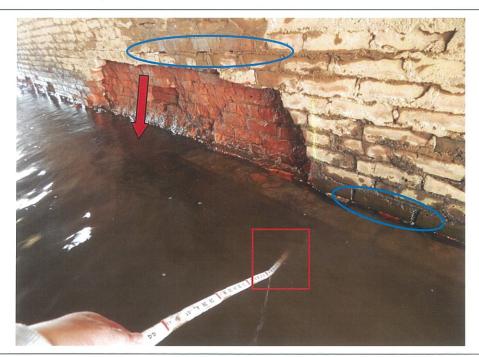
Missing bricks at west side of the brick arch, looking southwest. Note missing section of stone course approximately at center of the brick arch (arrow). Note also, the stone course is undermined throughout the brick arch length (rectangle) and deteriorated pointing at the brick arch intrados (circles).
